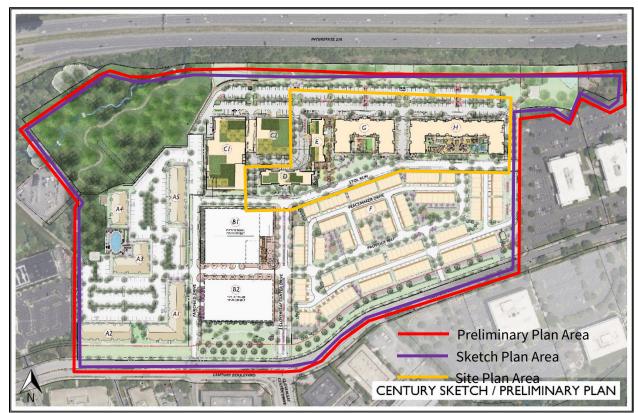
Sketch Plan, Preliminary Plan, and Site Plan Rendering
